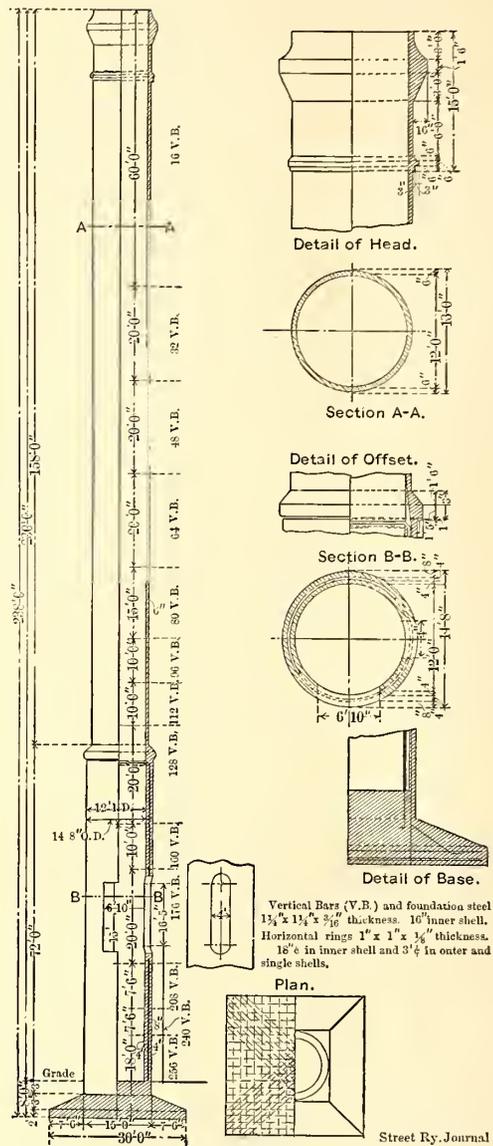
SHOWING PLAN, ELEVATION, SECTIONS AND OTHER DETAILS OF CONCRETE CHIMNEY
